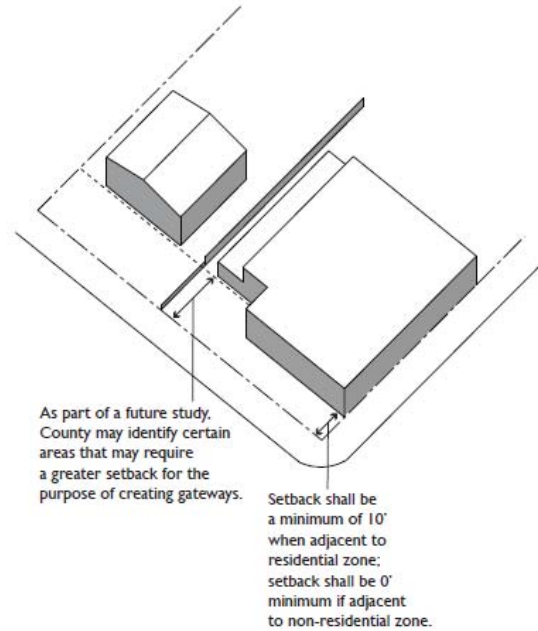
Residential Mixed-Use: Street Front Setback Adjacent to Residential
